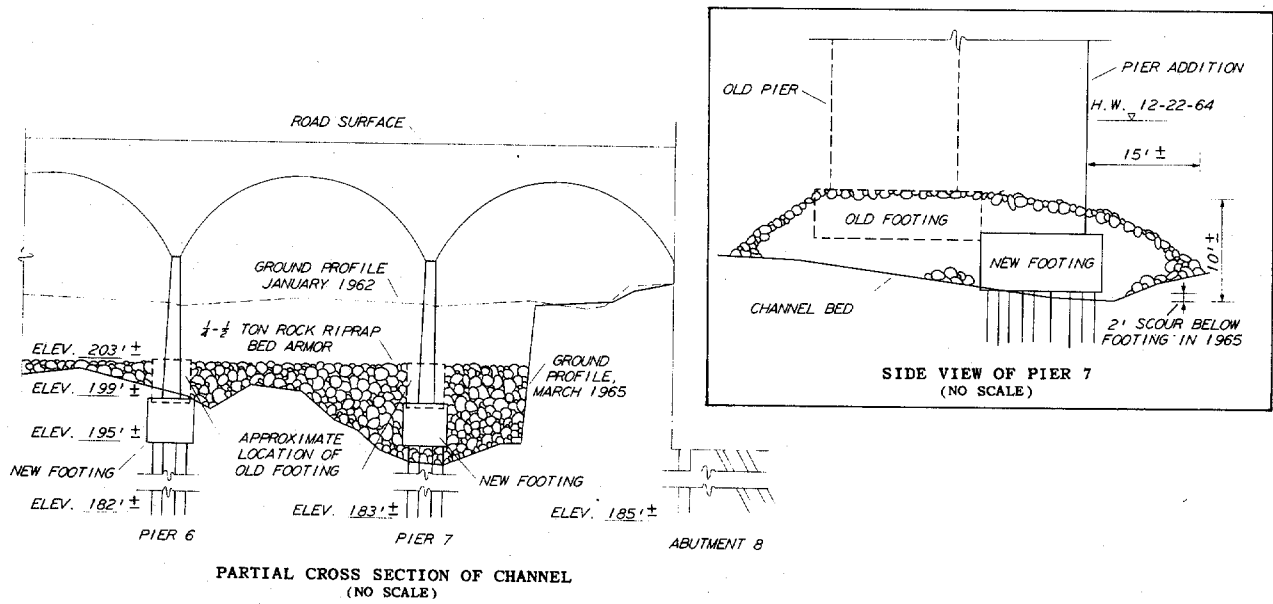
Details of new pier footings and rock riprap bed armor placed in 1965 to prevent pier scour.
